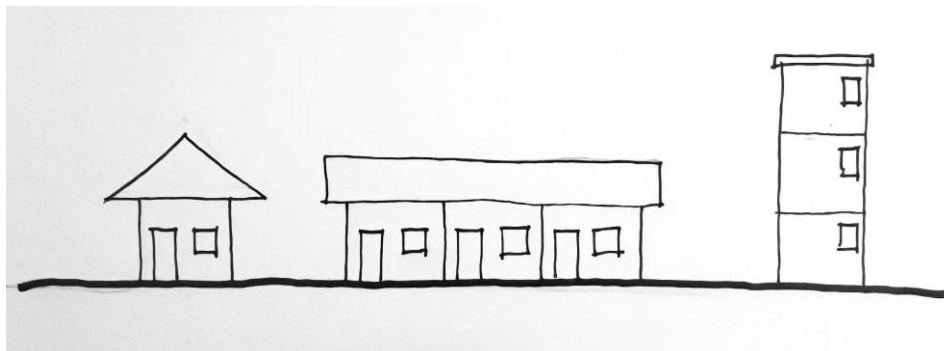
A detached house (left), row houses (middle), and stacked houses (right)
